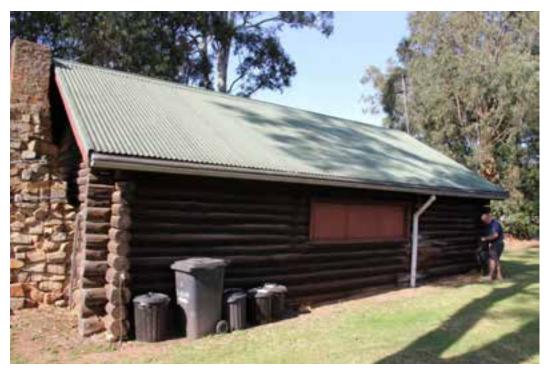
The north elevation with its wide timber-framed window with its original timber shutters (like the main elevation).
